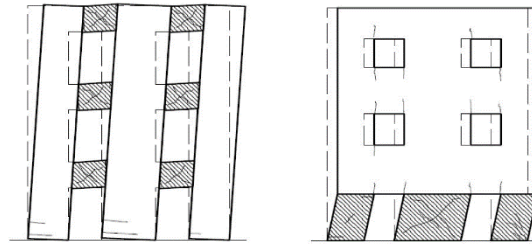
Plane rupture mechanism: (a) lintels(b) piers. (Candeias, 2008)
